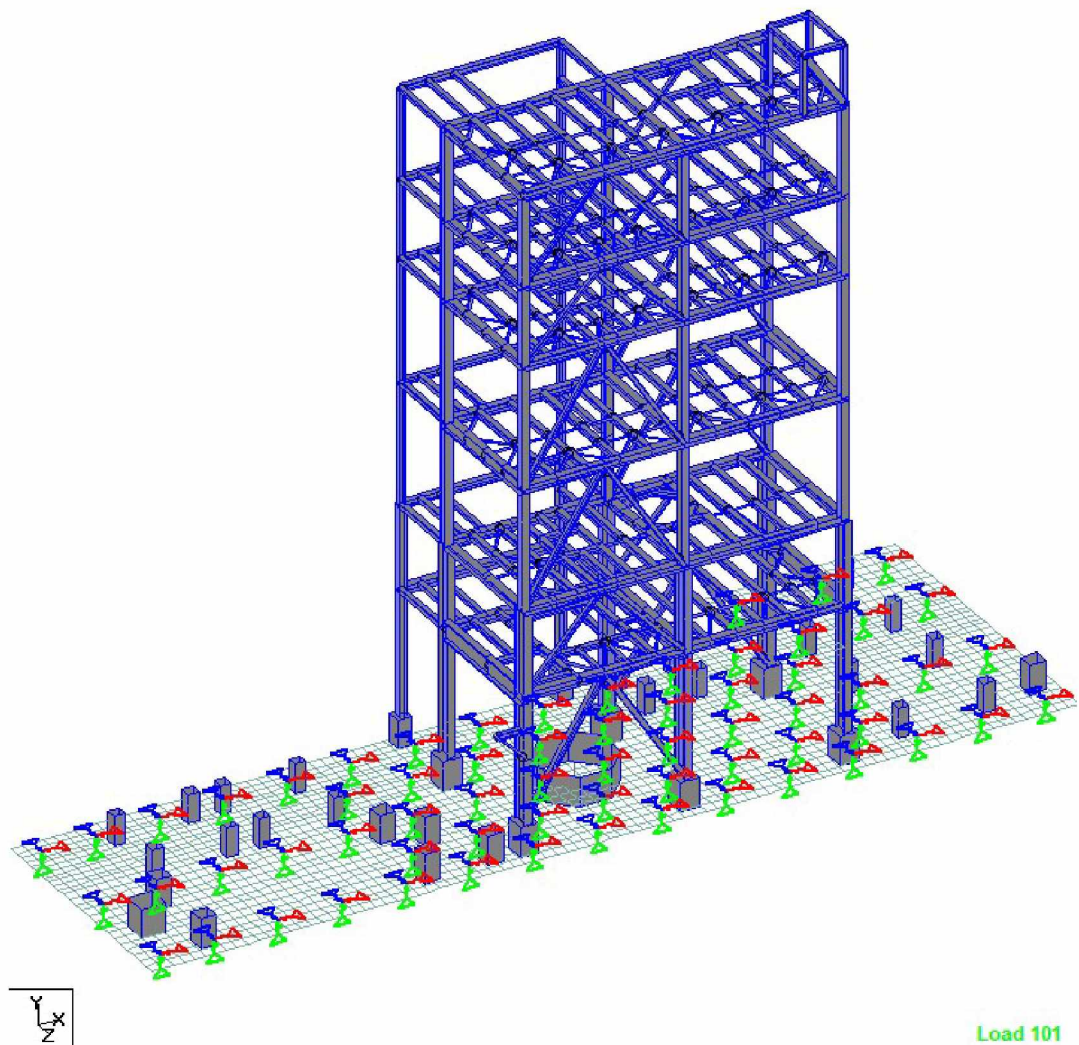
3-D Staad model view of structure for foundation design.
